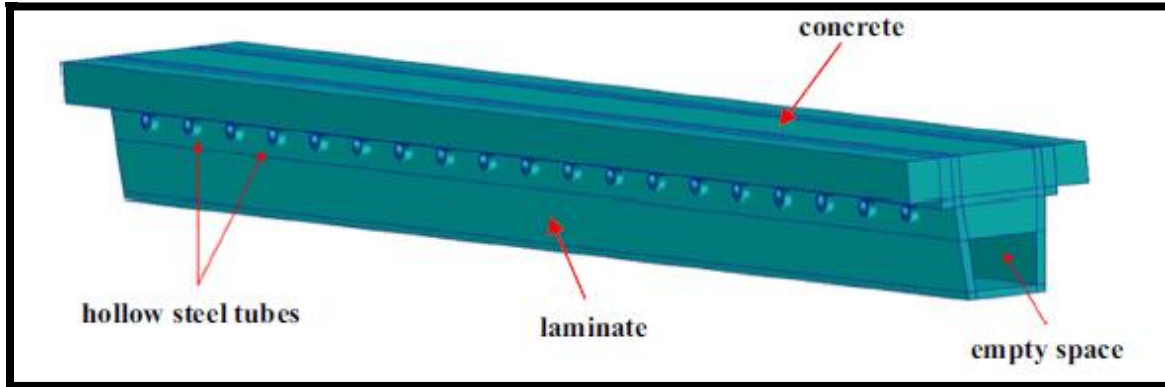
U-shaped girder with 8" reinforced concrete slab on top (*Papapetrou, 2017*).
